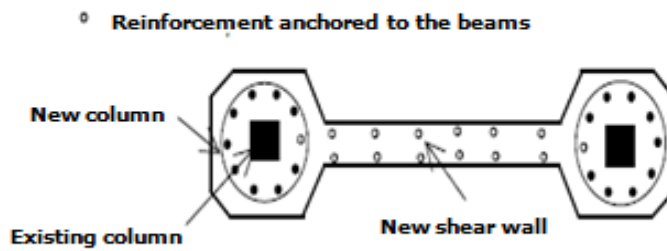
Addition of Shear Wall (KANEPE, 2013)
